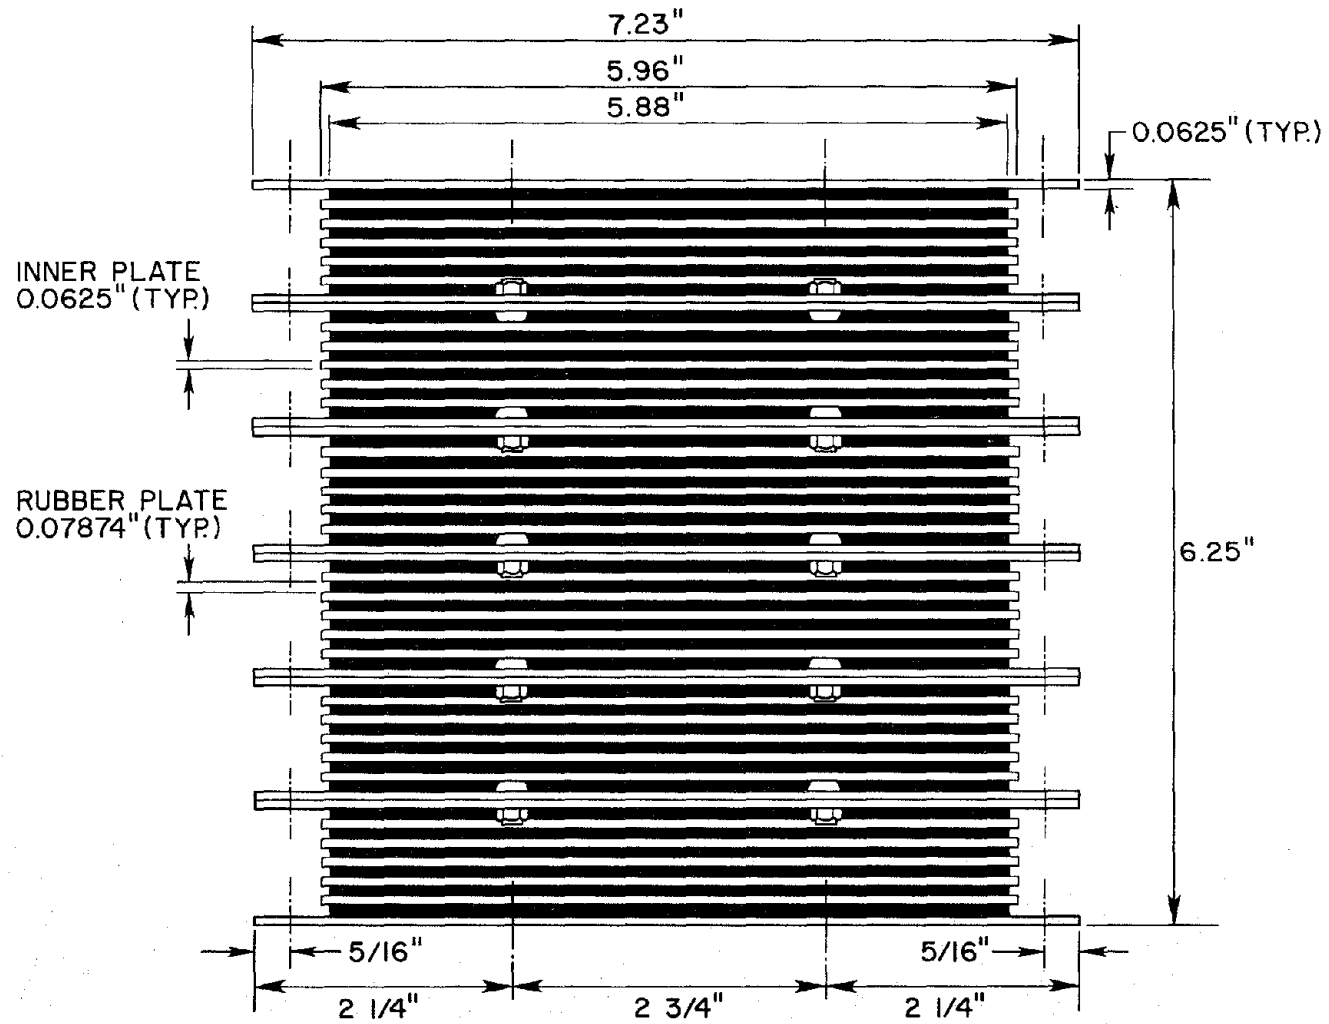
DIMENSIONS OF NATURAL RUBBER BEARINGS
